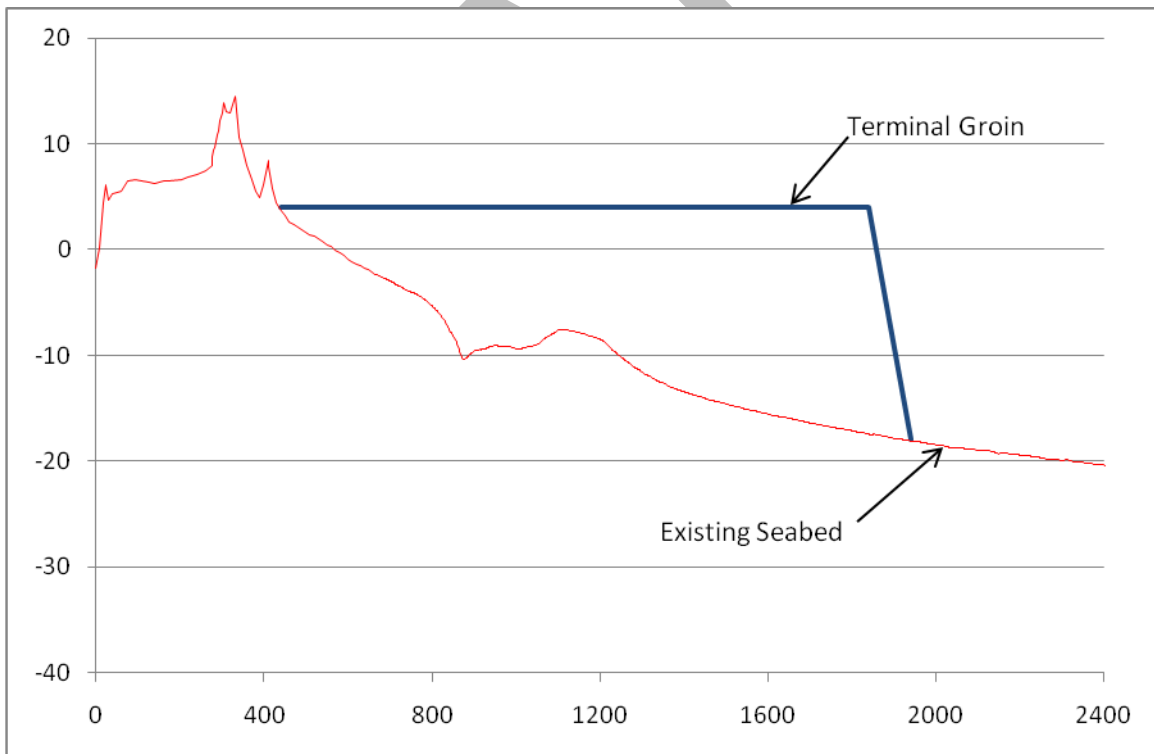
Groin Cross Section on a Flat-Sloped Beach
